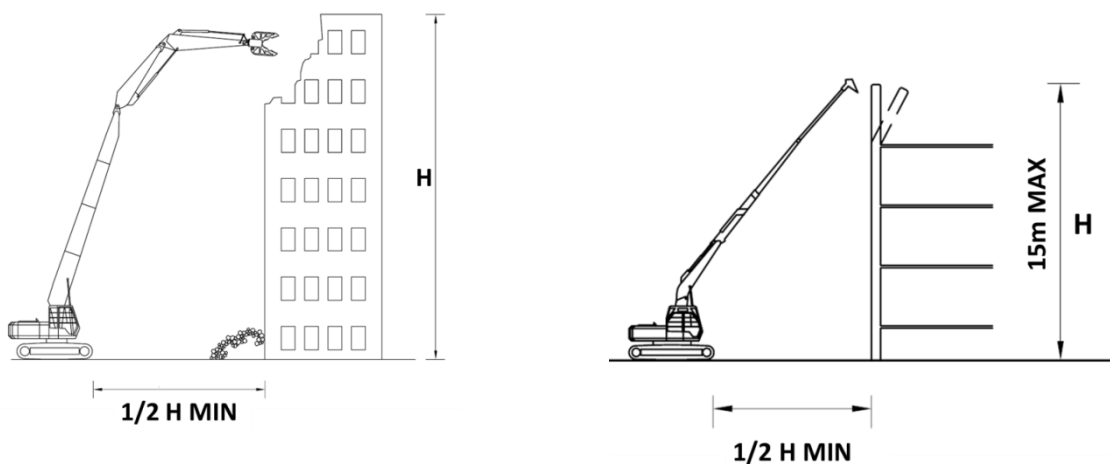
illustration of demolition methods (left) Hydraulic crushing, (right) Inward folding of walls with a pusher arm (Building-department, 2004)
